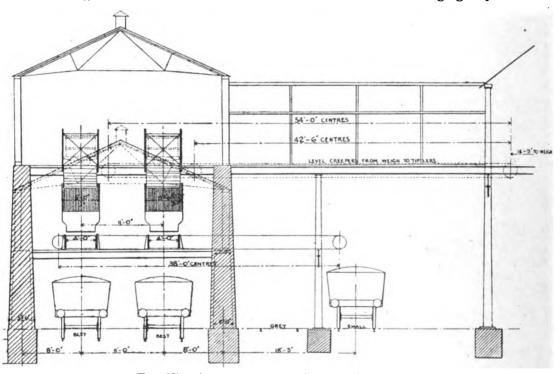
Arbangement at Cambois Colliery. Cross Section.
